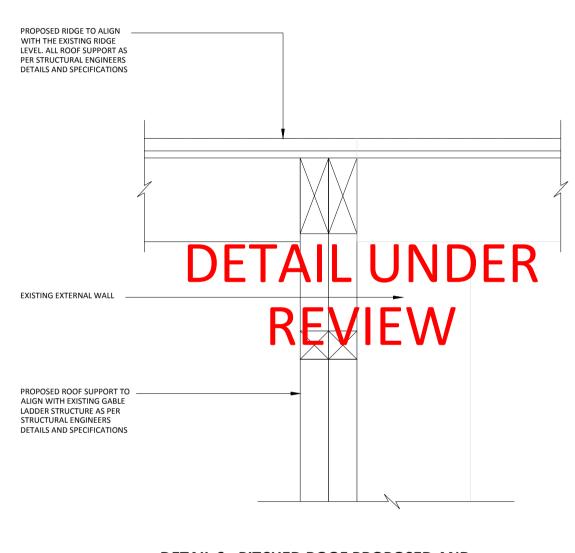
FLAT ROOF AND PITCHED ROOF
